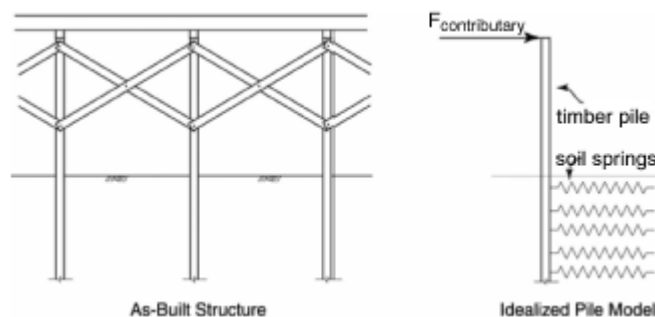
F-4-2—SIMPLIFIED SINGLE PILE MODEL OF A TIMBER PILE SUPPORTED STRUCTURE
